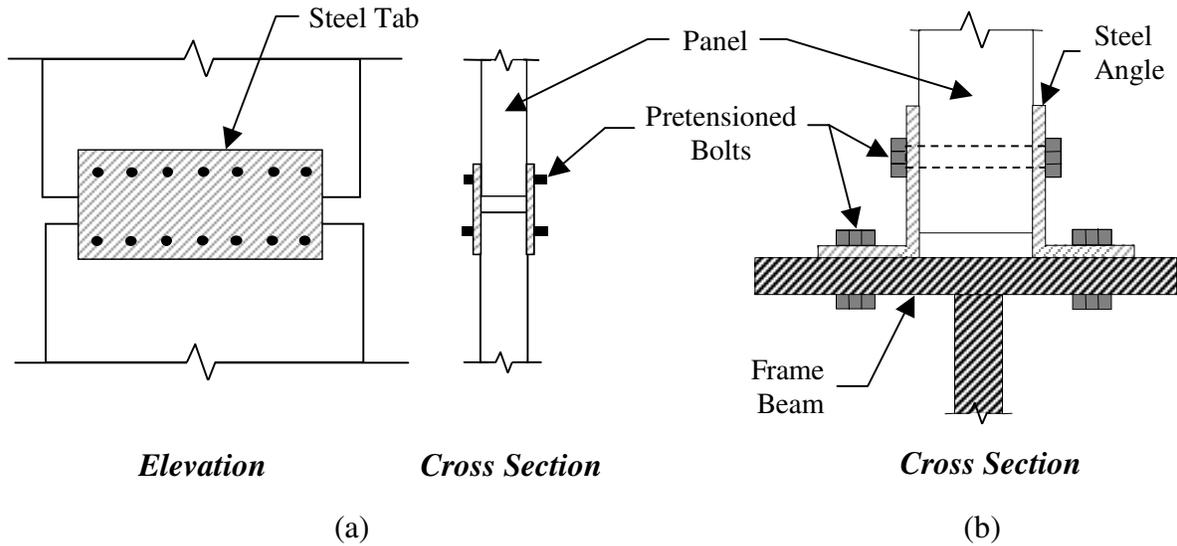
Connection details for panel-to-panel connections (a) and panel-to-frame connections (b).
